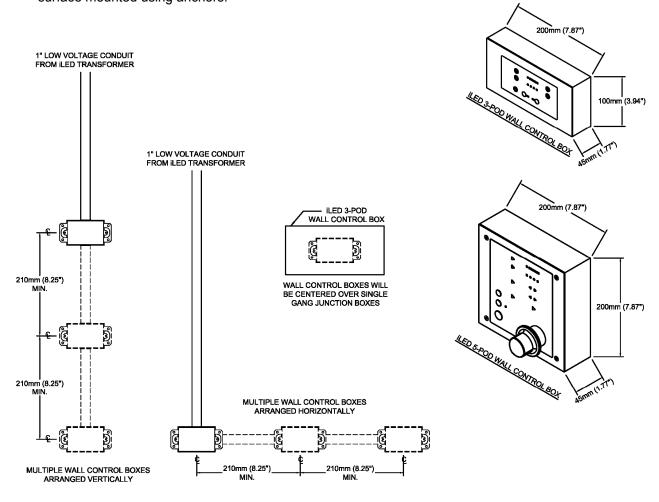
Surgical Light Wall Control Rough-in and Dimensions
